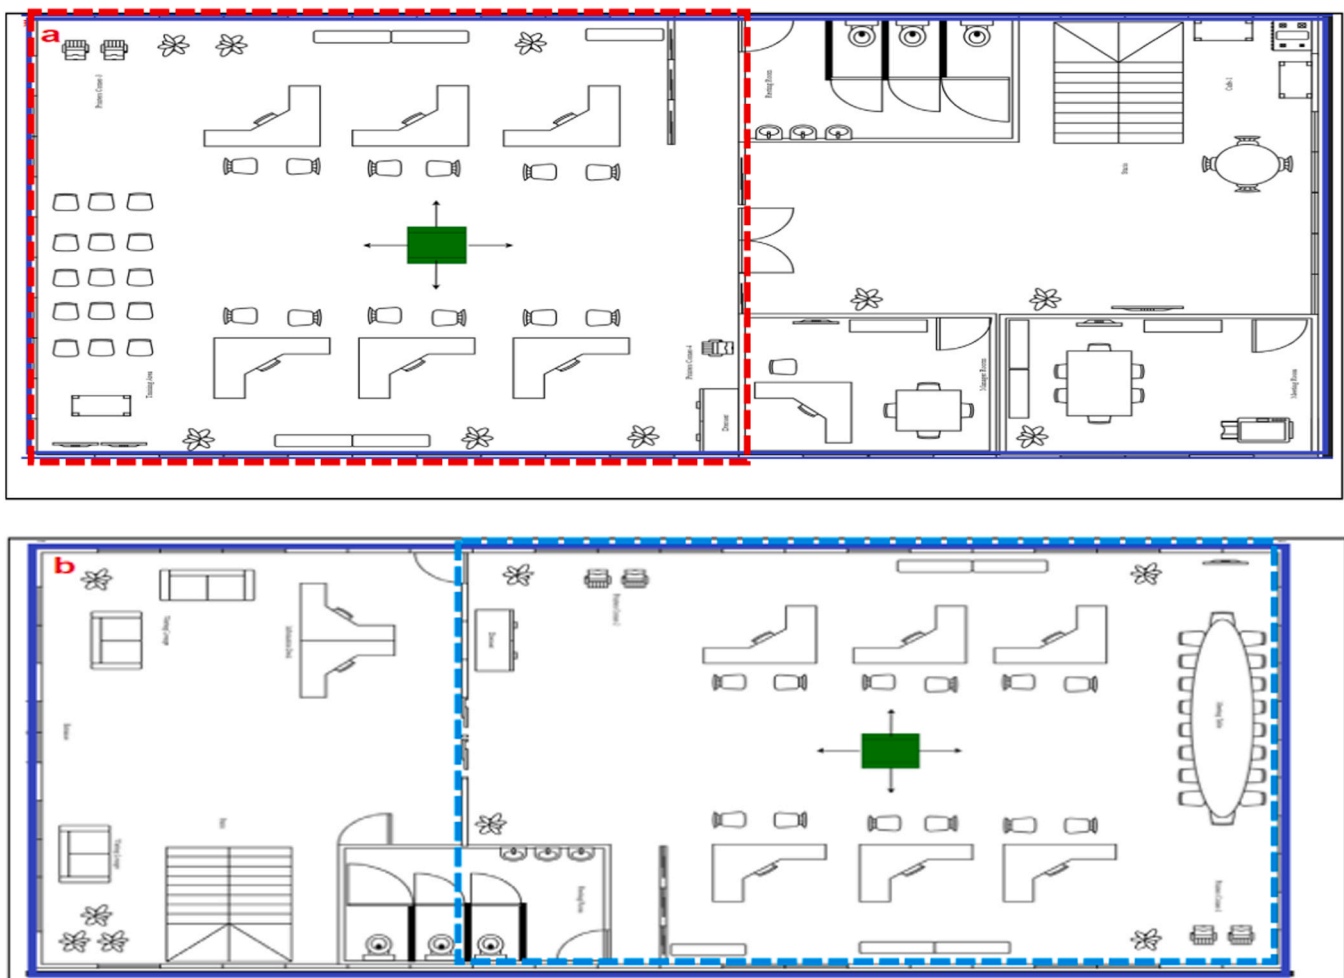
(a) shows the layout of the 2nd and 3rd floors of the administration building. The red hatched area, approximately 120 square meters, is similar on both floors. Fig. 4(b) shows the floor plan of the ground floor, where the green box indicates the placement of the APVS. The blue hatched area represents 150 square meters, which is the size of the ground floor. The border color is used to differentiate the office space boundaries. The plan does not reflect the actual dimensions, but is scaled proportionally to represent the actual office space and equipment dimensions.
